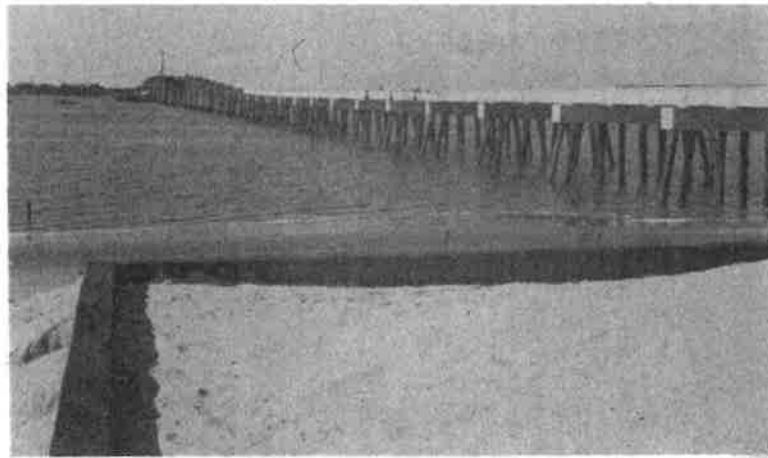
Great Egg Harbor Bay Bridge (looking south), Garden State Parkway, N.J.
